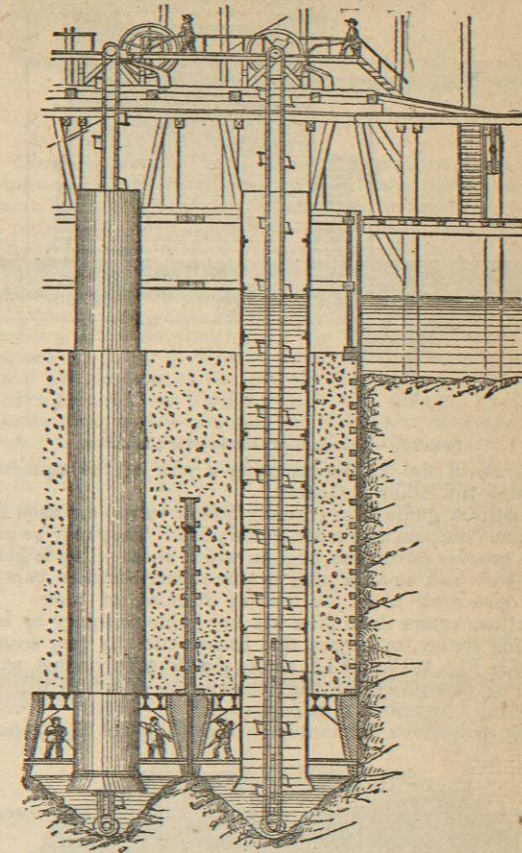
Foundations, Bridge of Kehl on the Rhine.
